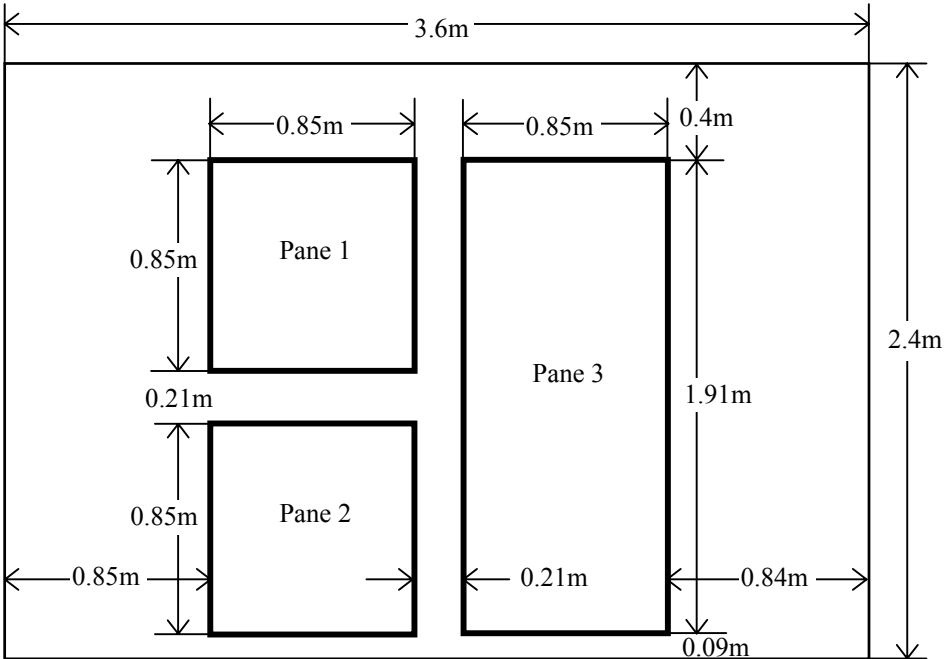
External elevation of the windowed wall of the FireSERT ISO compartment.
